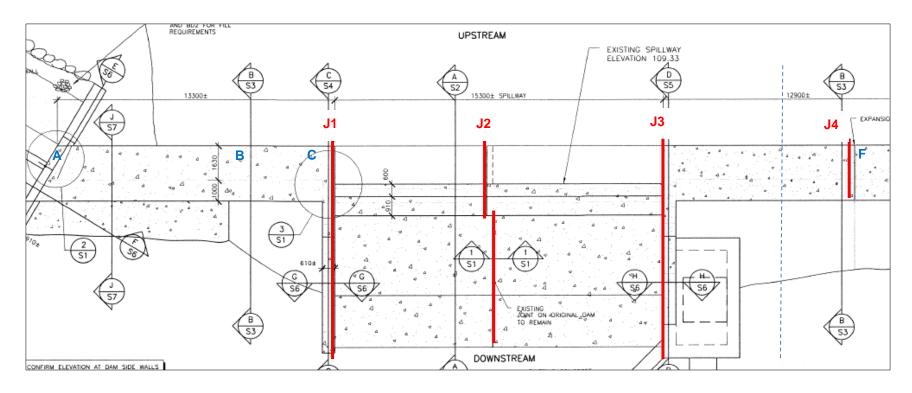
Plan of joint naming convention (adapted 2006 construction plans S1). Approximate locations of blue field lettering also shown.
